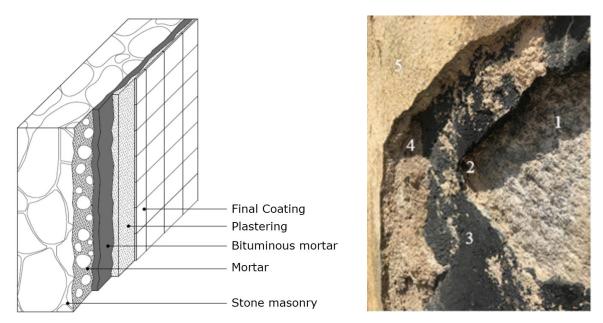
Diagram (left) illustrating the successive main layers of a stone masonry wall cladding with bituminous mortar and example of the different layers from a typical wall (right): 1) stone masonry; 2) Grout for repointing joints; 3) Bituminous mortar; 4) Plastering; 5) Final coat (painting). Diagram and photo by Andrea Lier-Kluge.
